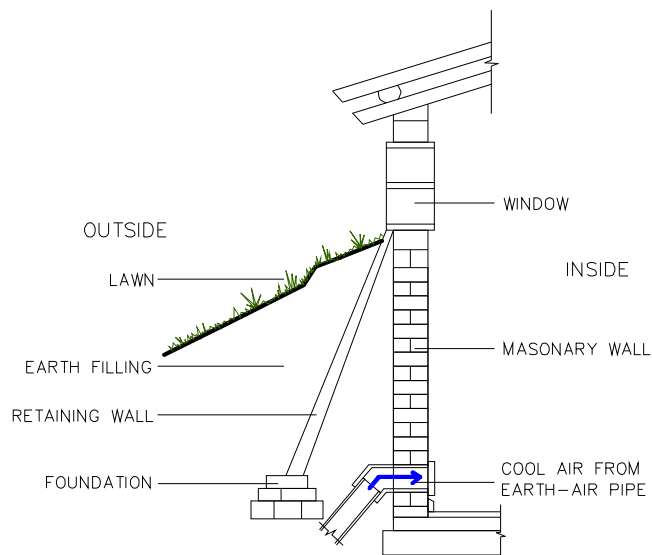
Section showing earth berm at the Dilwara Bagh House, Gurgaon
